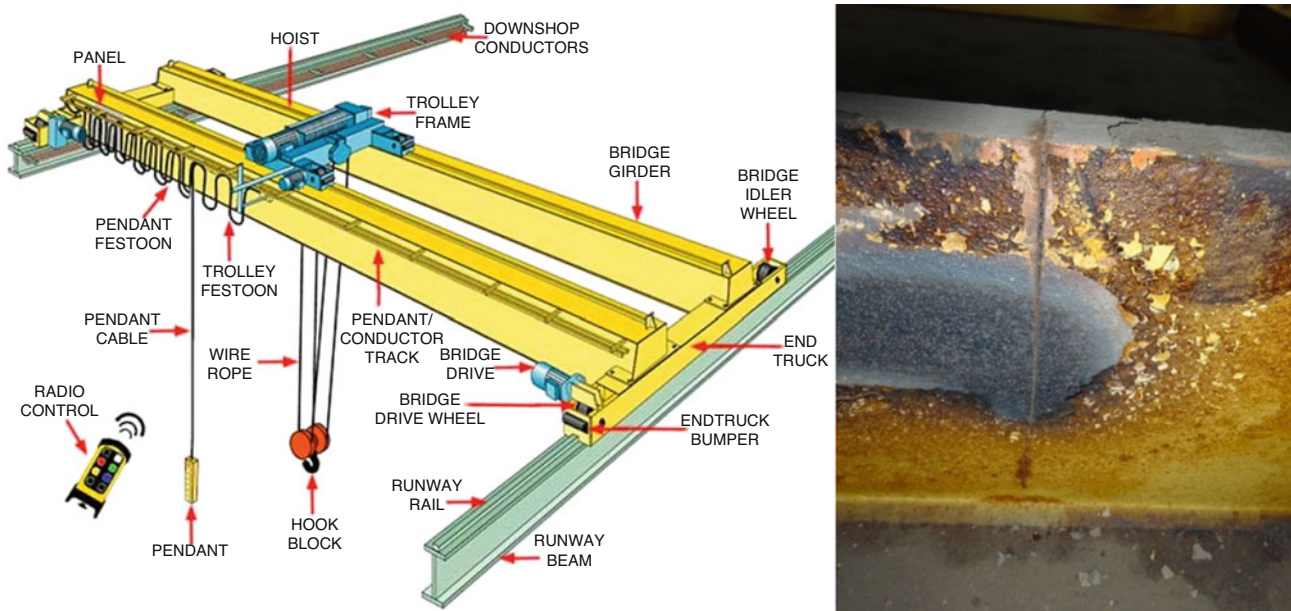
Left – parts of an overhead crane for illustrative purposes [1]. Right – example of a crack on the upper flange of a runway beam
